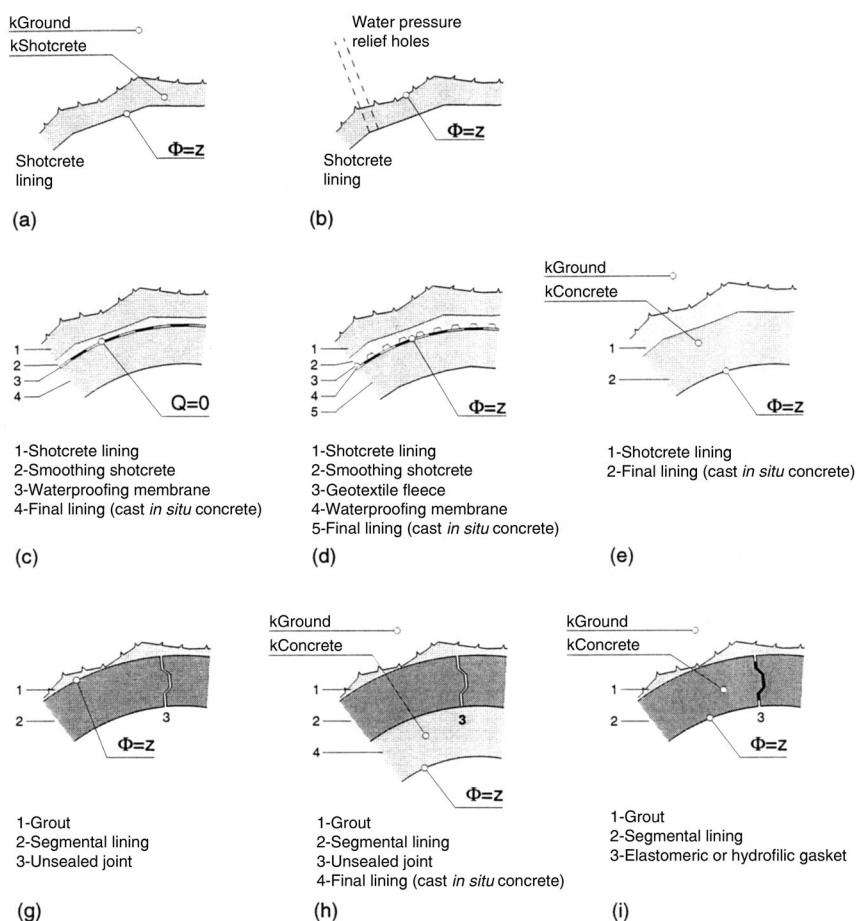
Hydraulic boundary conditions at the tunnel walls
